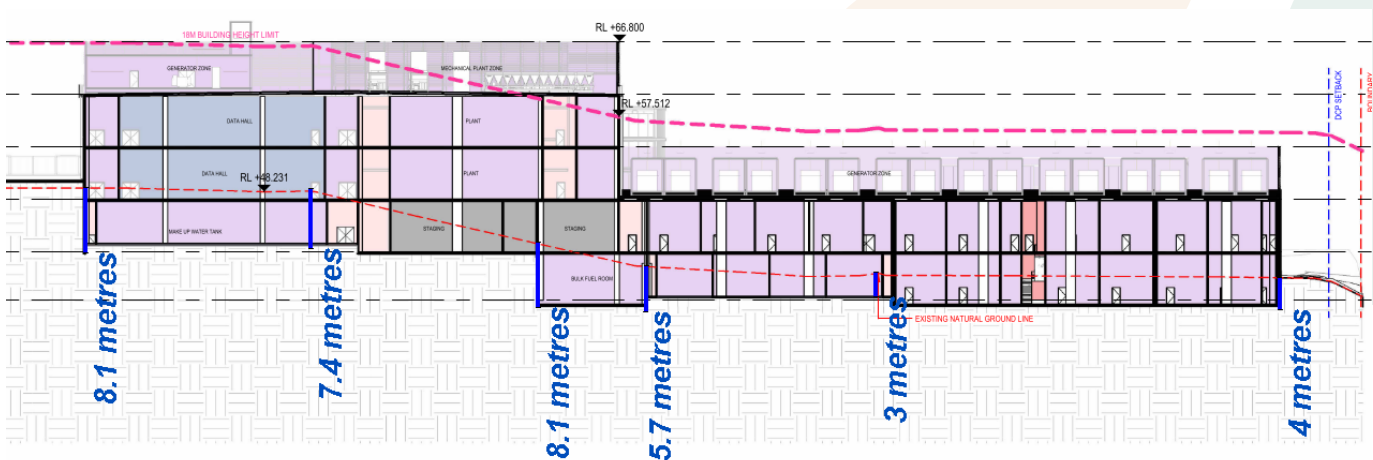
Section through the site with existing ground level in dashed red and levels of excavation depicted in blue (Source: Architectural Plans)
